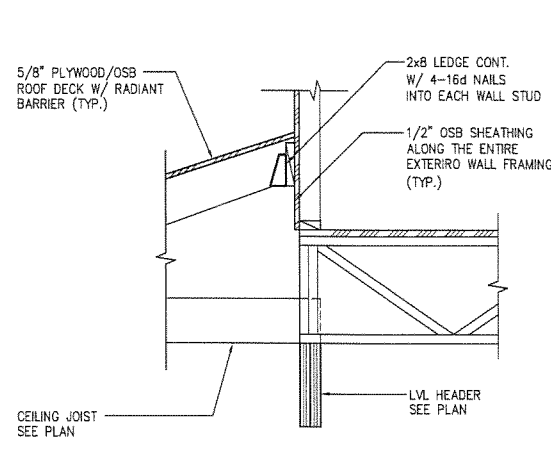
DETAILS SCALE TO 3/8"=1'-0" IN 11X17 SHEET
